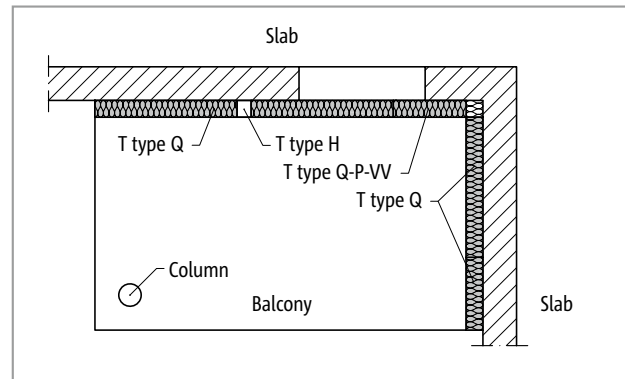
Schöck Isokorb® XT type Q, Q-P-VV: Balcony supported on two sides with column and positive shear forces
